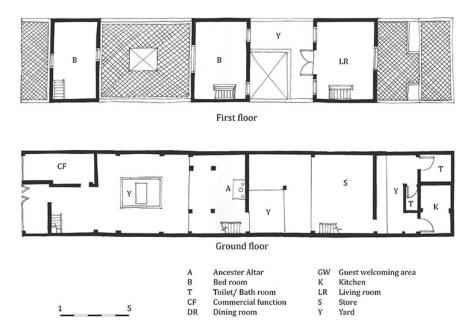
Plan of house no 47 in *Hàng Bạc* Street, Old quarter, Hanoi (Adopted from Kien, 2008a¹²)
